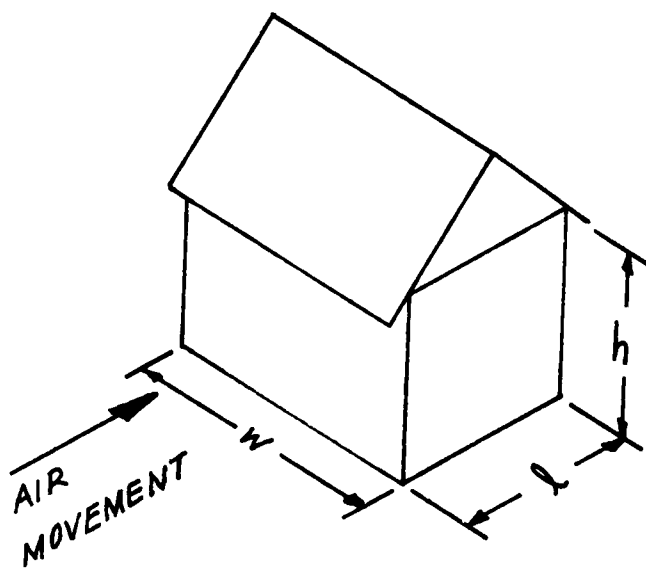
Structure With a Gabled Roof Exposed to Wind.
